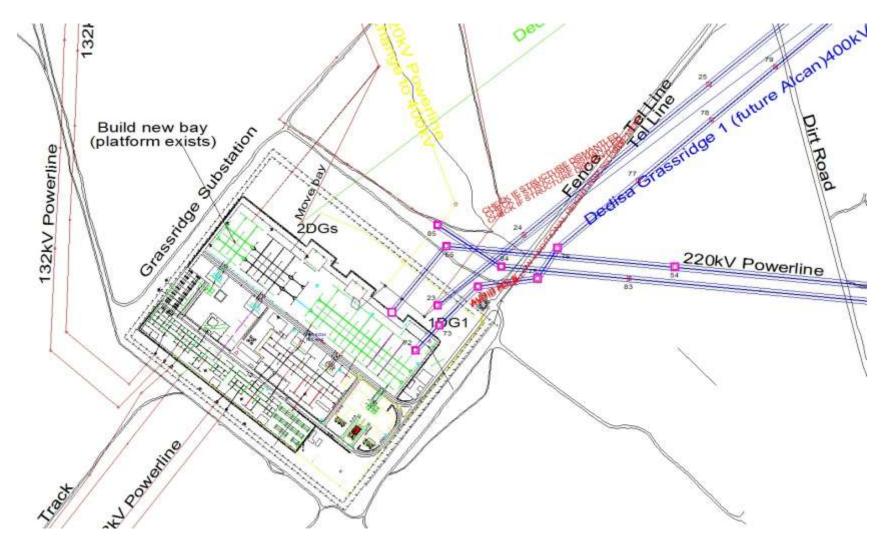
Development plan indicating the proposed construction sites and relevant access tracks that must be used
